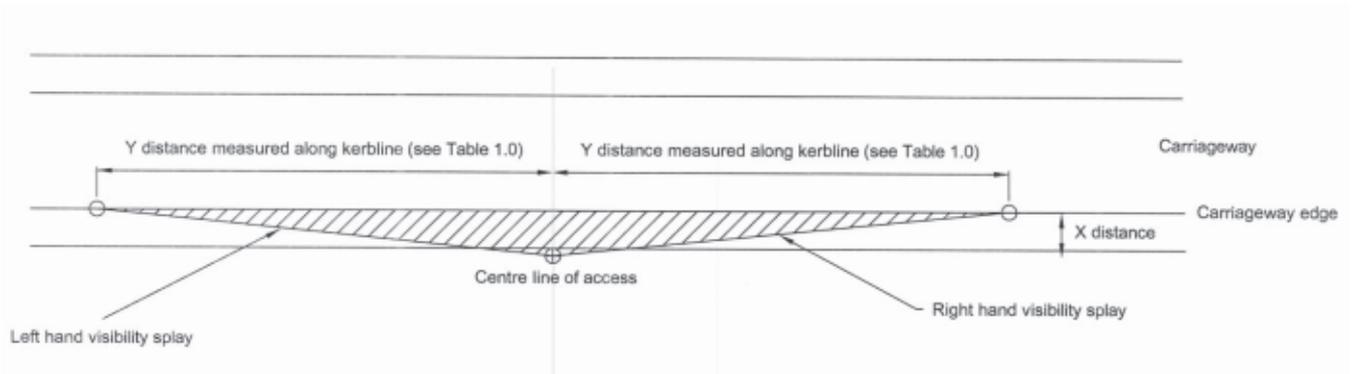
Access visibility splay for traffic exiting development access where access is on a straight highway (measured to nearside edge of carriageway).
